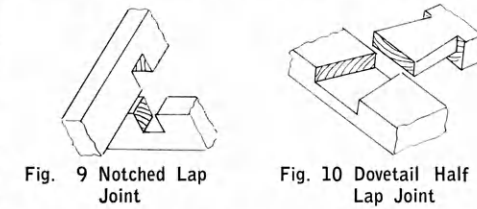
Notched Lap Joint Fig. 10 Dovetail Half Lap Joint
